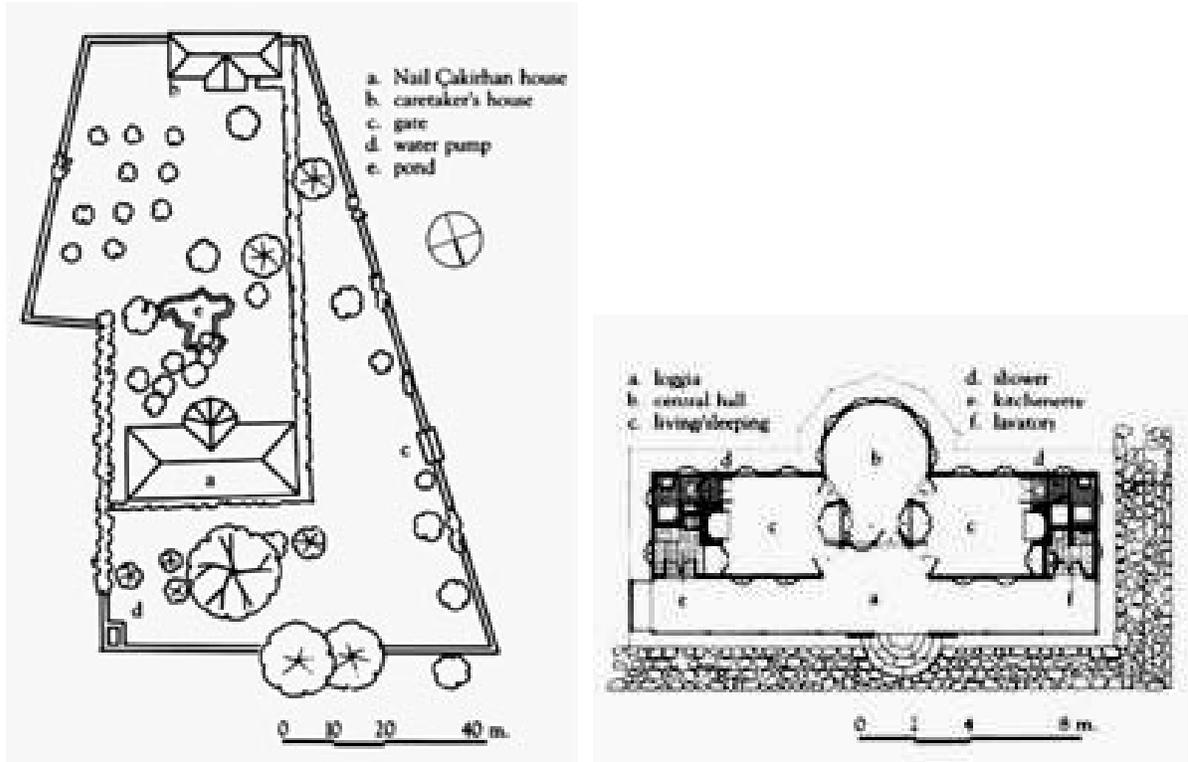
Site plan (left) and plan of the house (right) (Abdulac, 1983)
